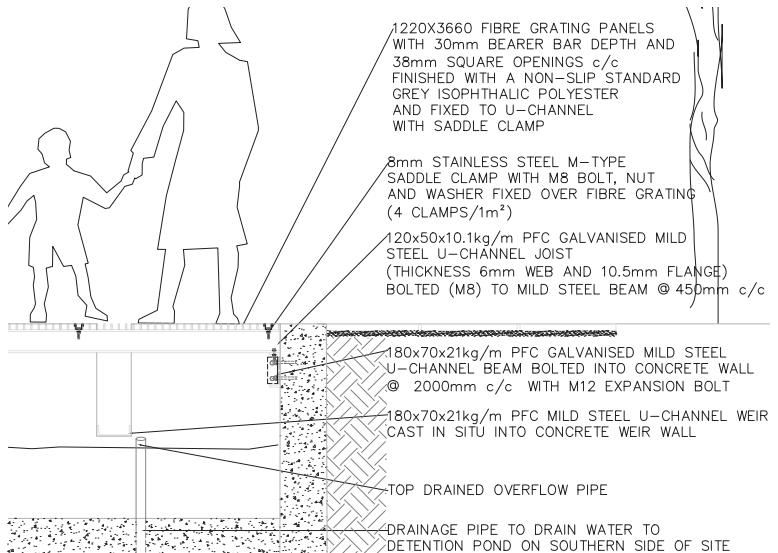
Detail 4.2-Fixing detail through fibre grating - not to scale (Author: 2013)
